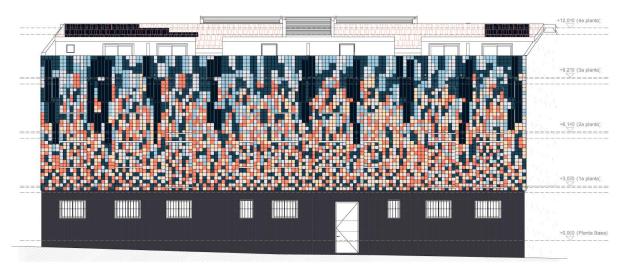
BUILDING FAÇADE, EAST ELEVATION, SHUTTERS CLOSED
